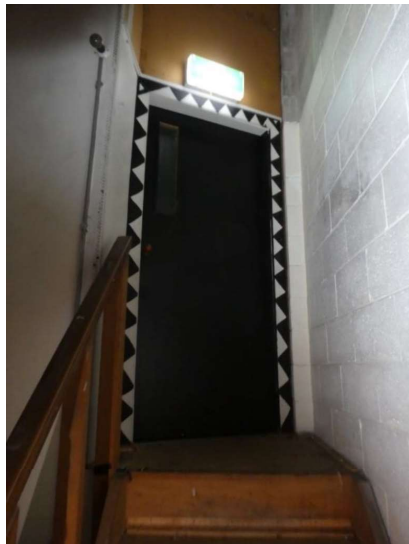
Showing the defective plaster within the north western stairwell.
